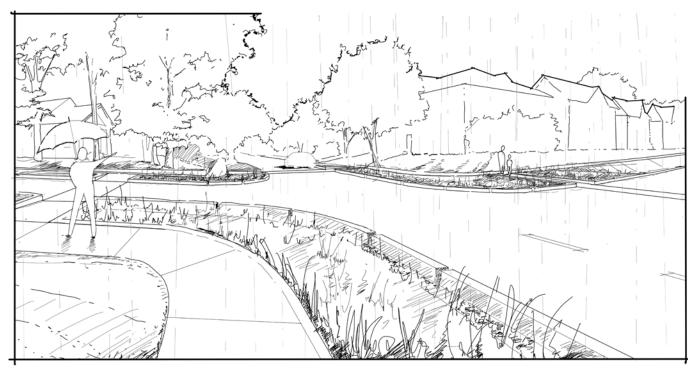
Sketch of rain garden bump-outs integrated into new street design at Walker Avenue intersection.
